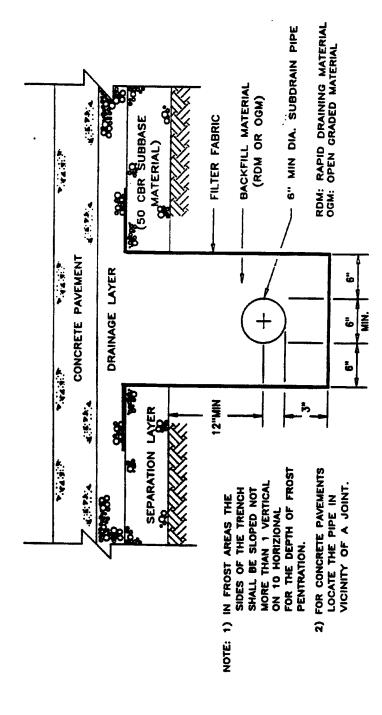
Typical Concrete Pavement Interior Subdrain Detail
